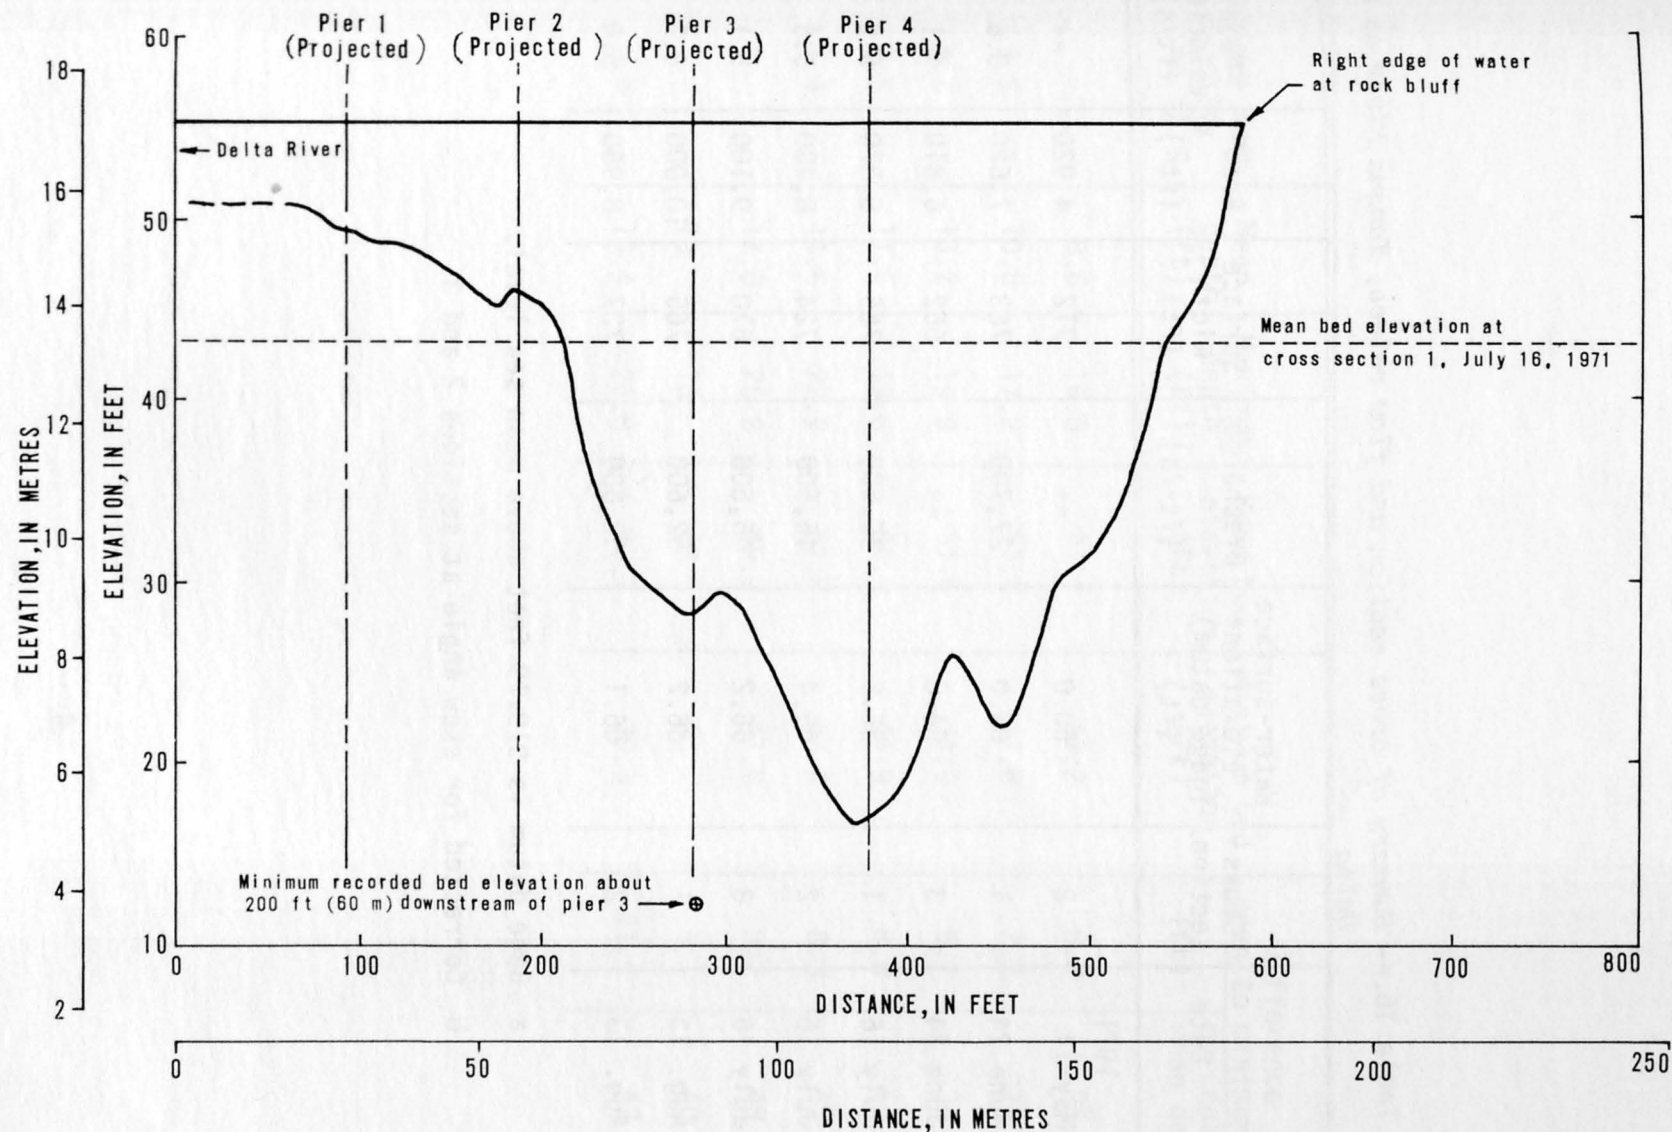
Cross section 4, 150 ft (45.7 m) downstream from bridge 524, July 16, 1971, Tanana River at Big Delta.
